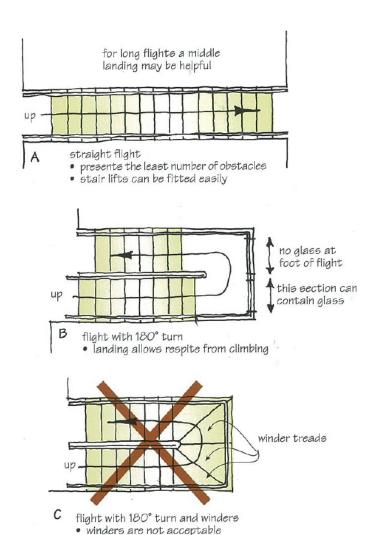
Preferred and inappropriate stair layouts in plan.
